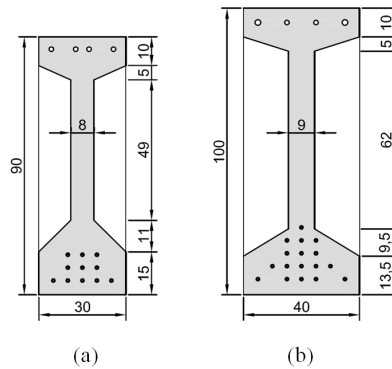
Cross-sections of beams B-900 (a) and B-1000 (b) (dimensions in cm)
